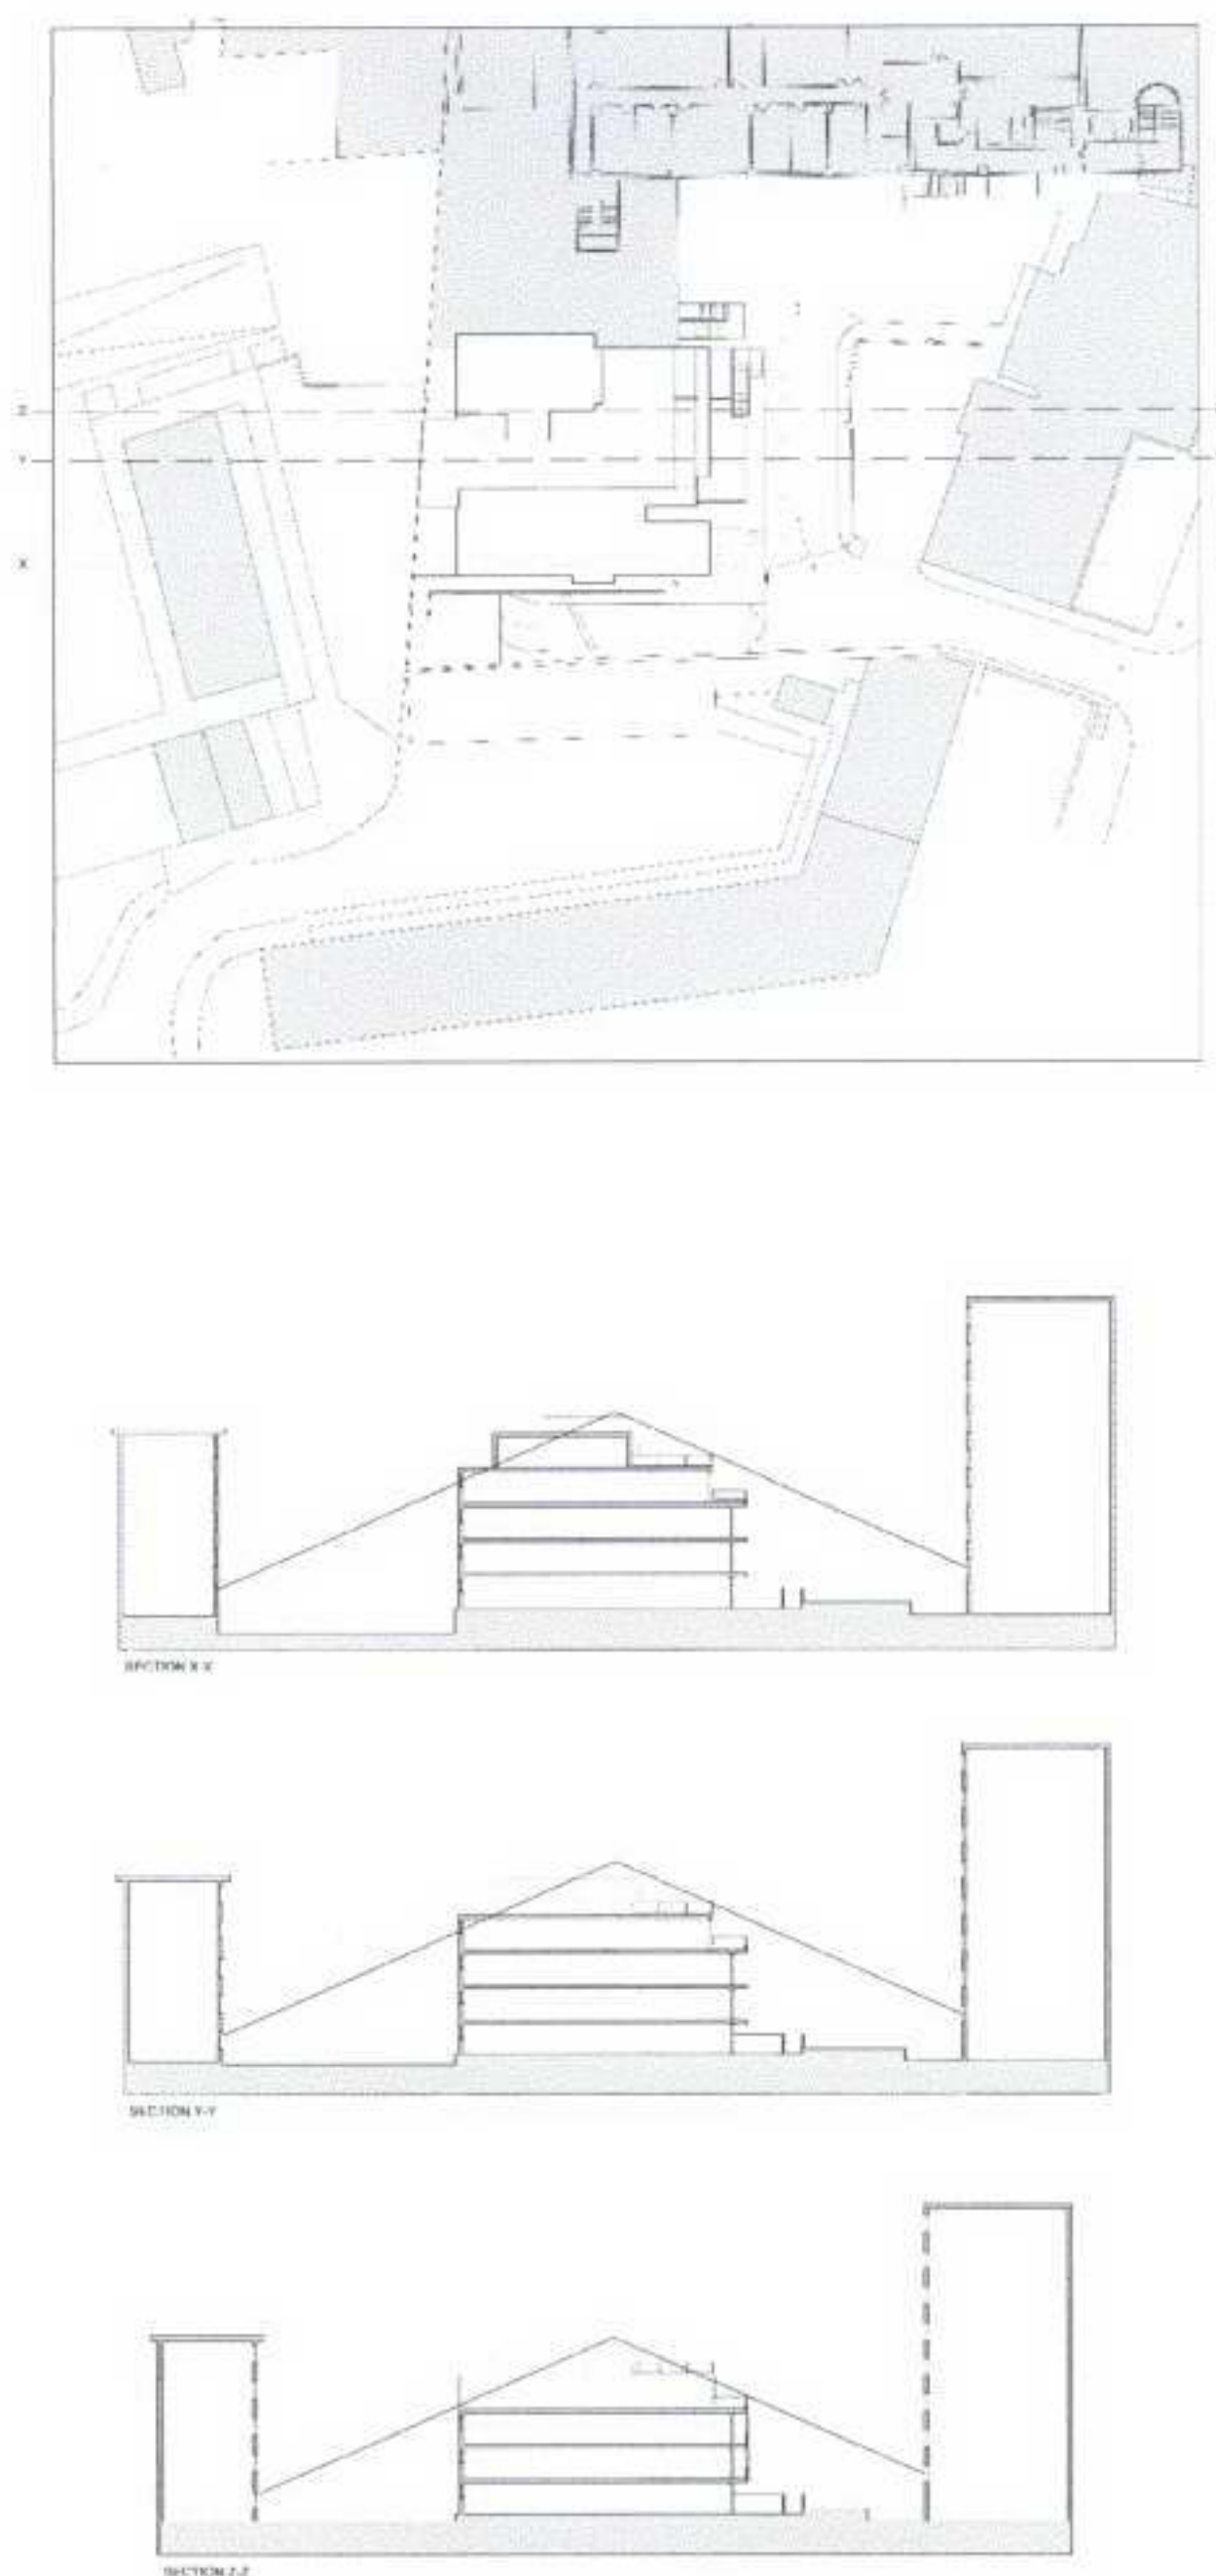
Sections X, Y, Z Campden House and Swiss Terrace/Station House
